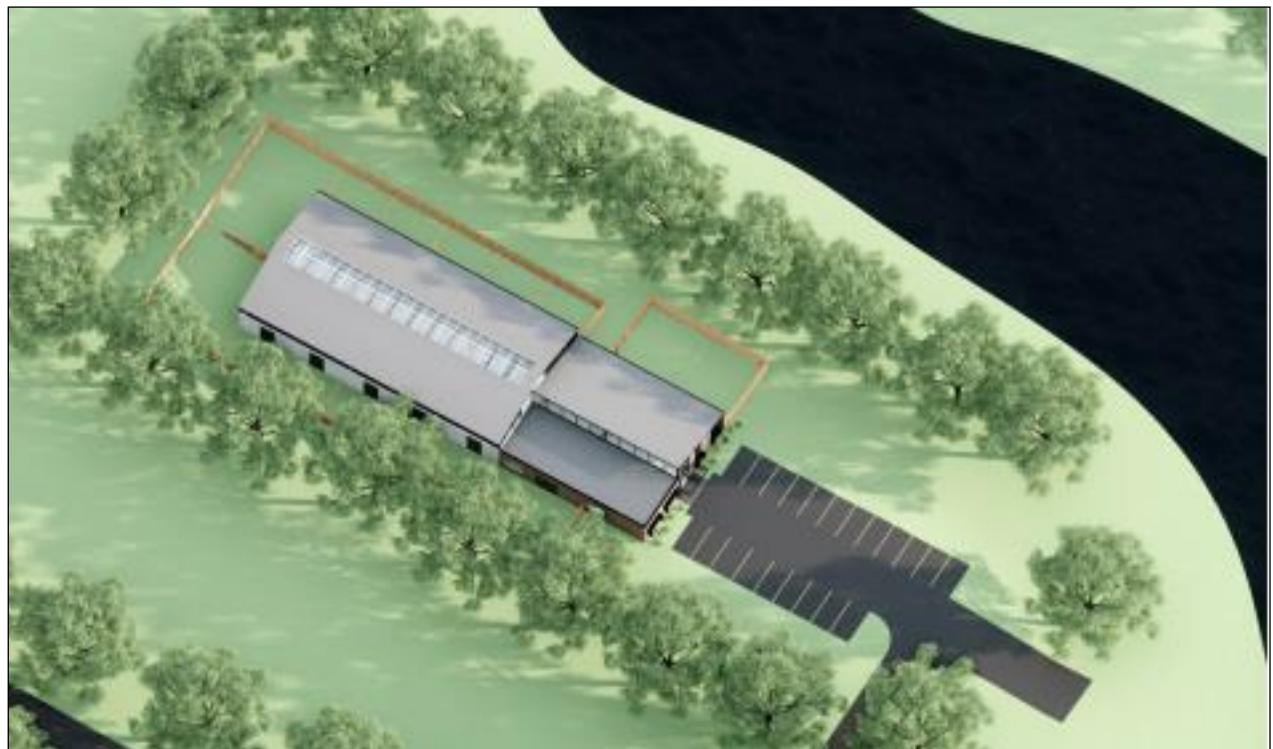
Proposed 3D render of dog breeding facility (birds eye view)
